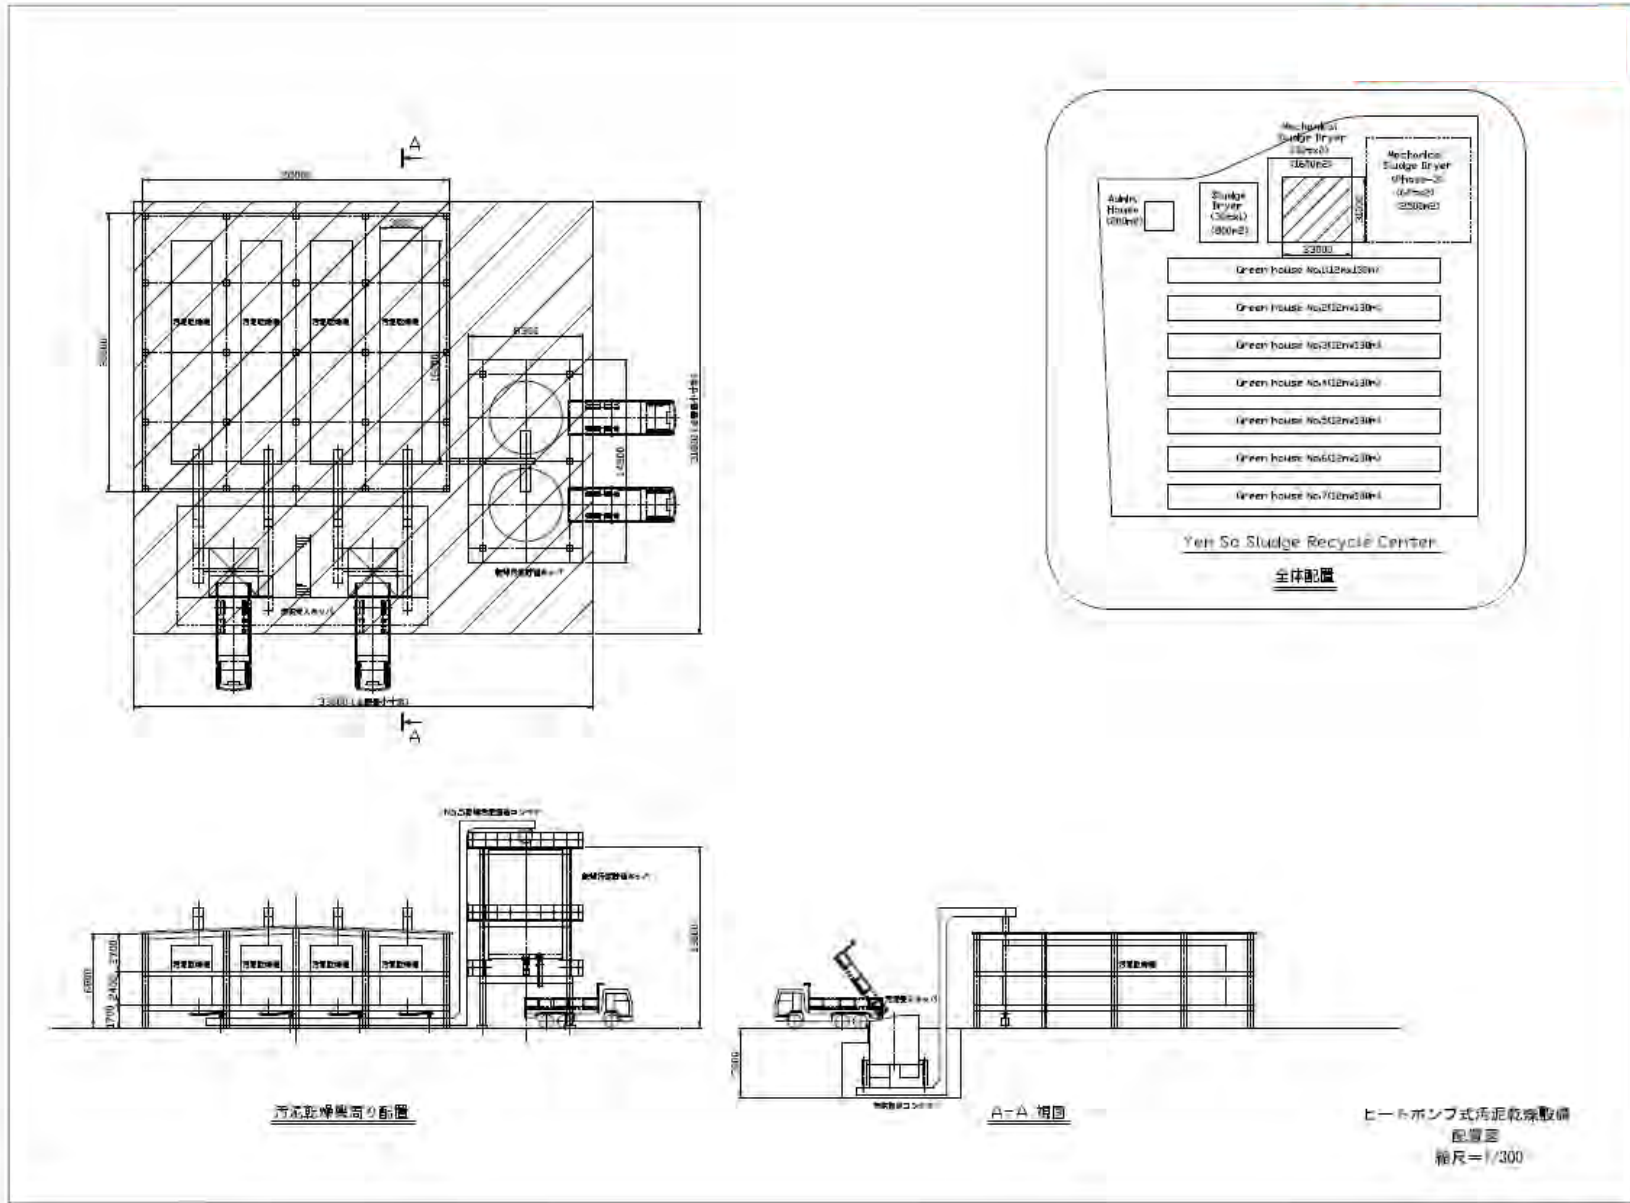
Plot Plan of the Sludge Dryer (Heat Pump Type) (Source: JICA Study Team)
